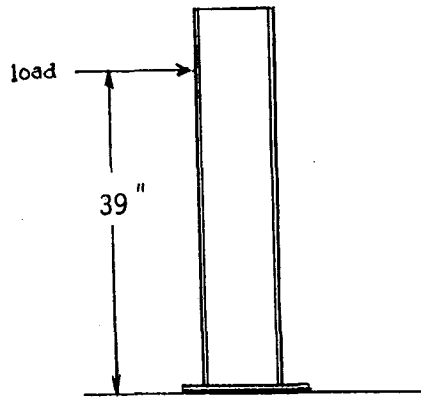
DETAIL OF STEEL GUARDFENCE POST AND ATTACHMENT TO CULVERT SLAB.
